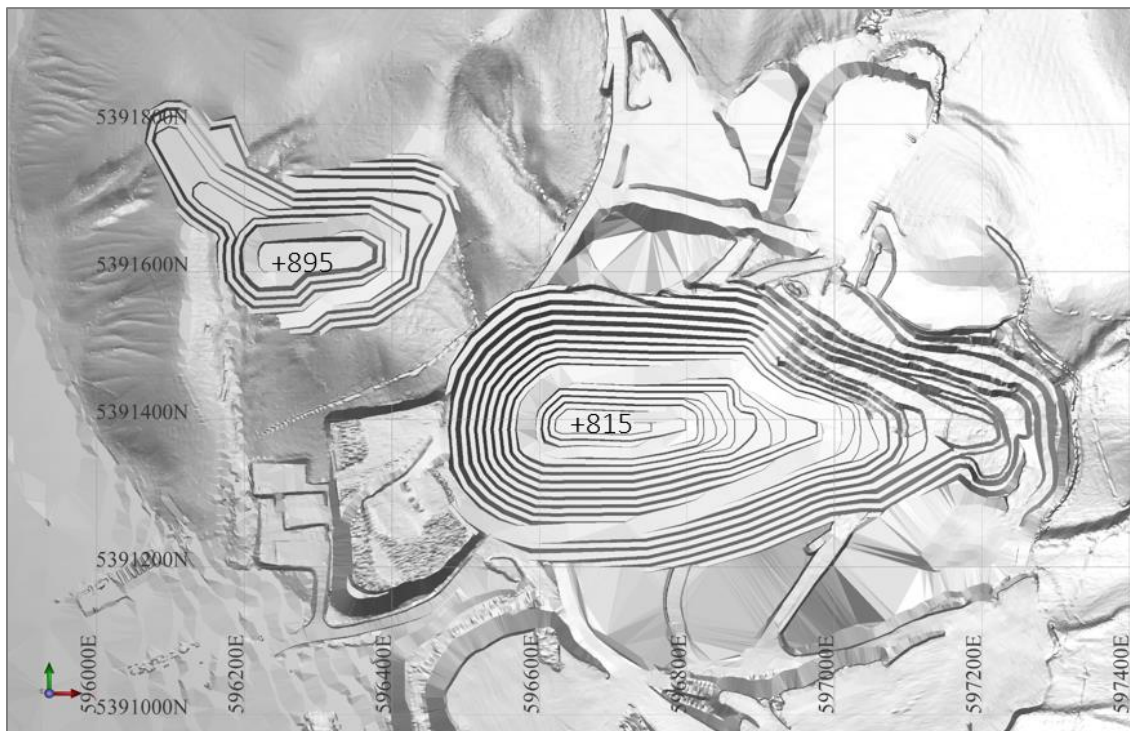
Ulaanbulag Ultimate Pit Design, Plan View
